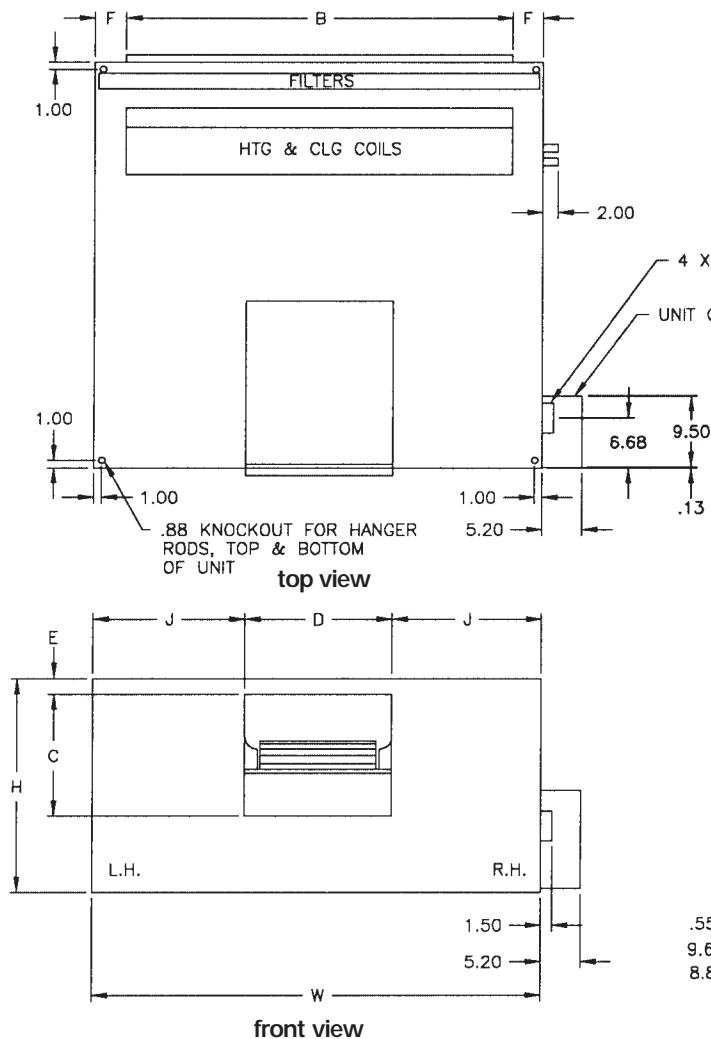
Top view of blower coil unit showing recommended service and code clearances.
